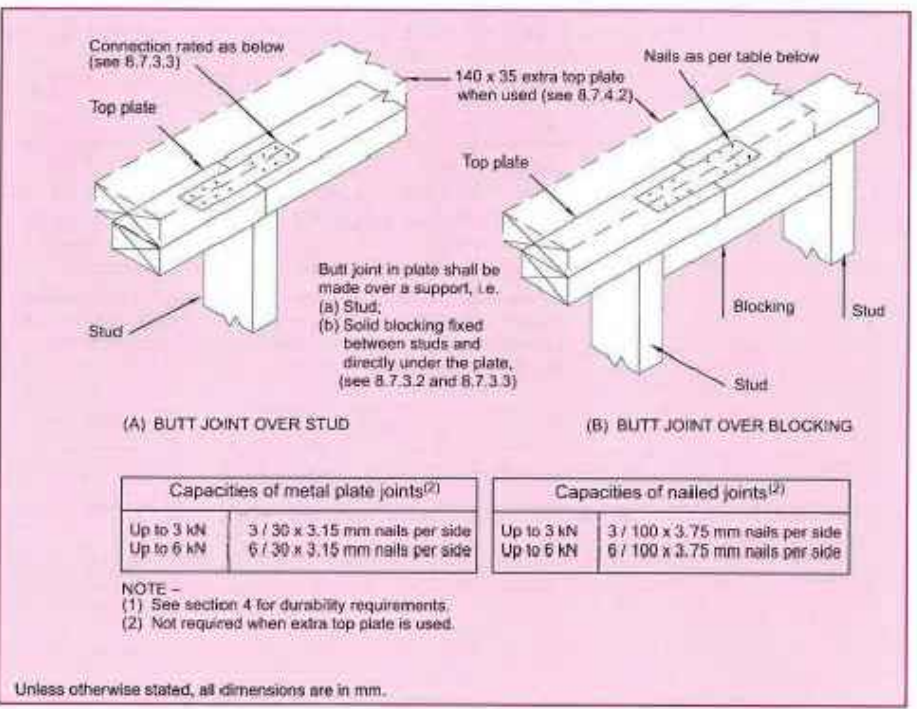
Connecting top plates in line – Walls containing bracing (see 8.7.3.3)
